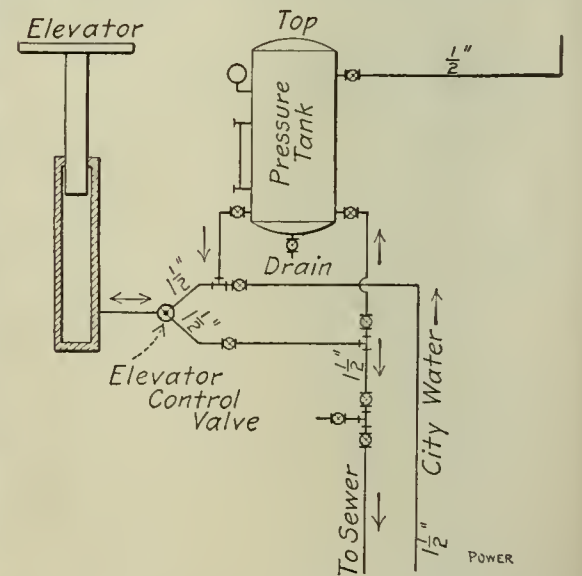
HYDRAULIC ELEVATOR SYSTEM
